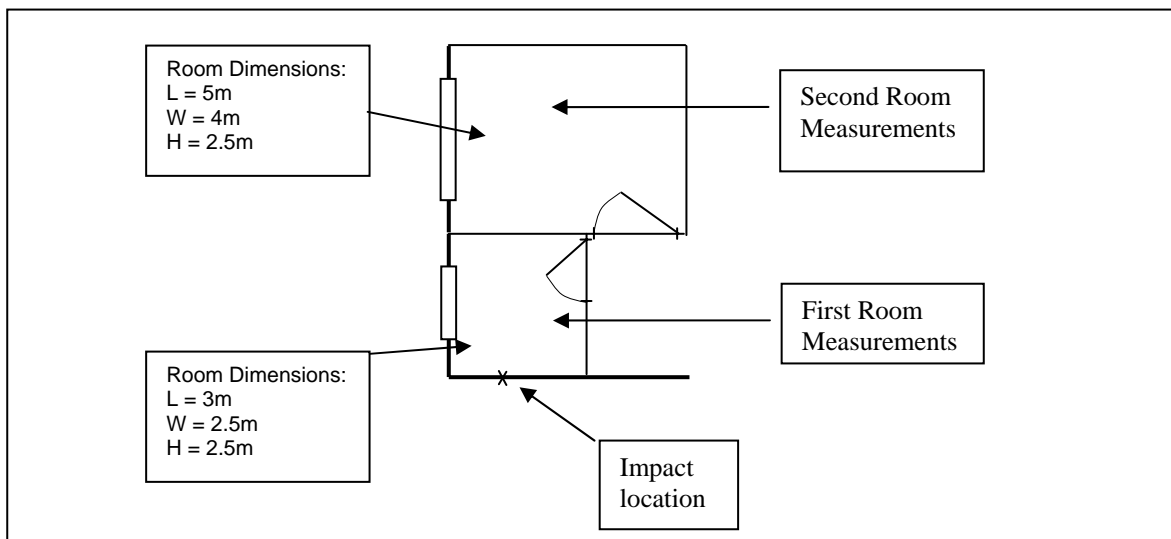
Sketch of test location at test site 1. Plan view of first floor.
